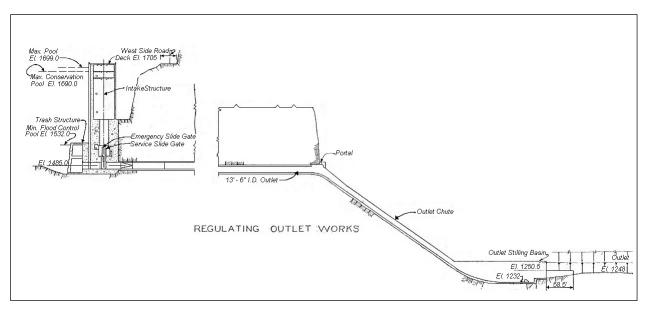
Cross section of Cougar Dam regulating outlet works.
